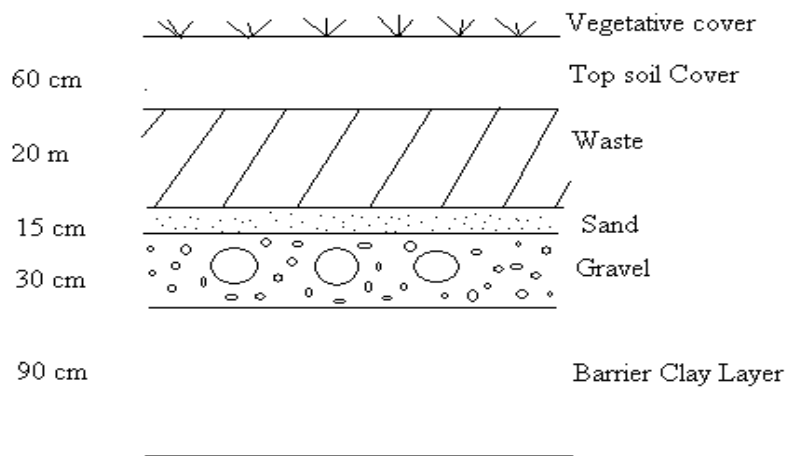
Cross-sectional view of the semi-engineered landfill
